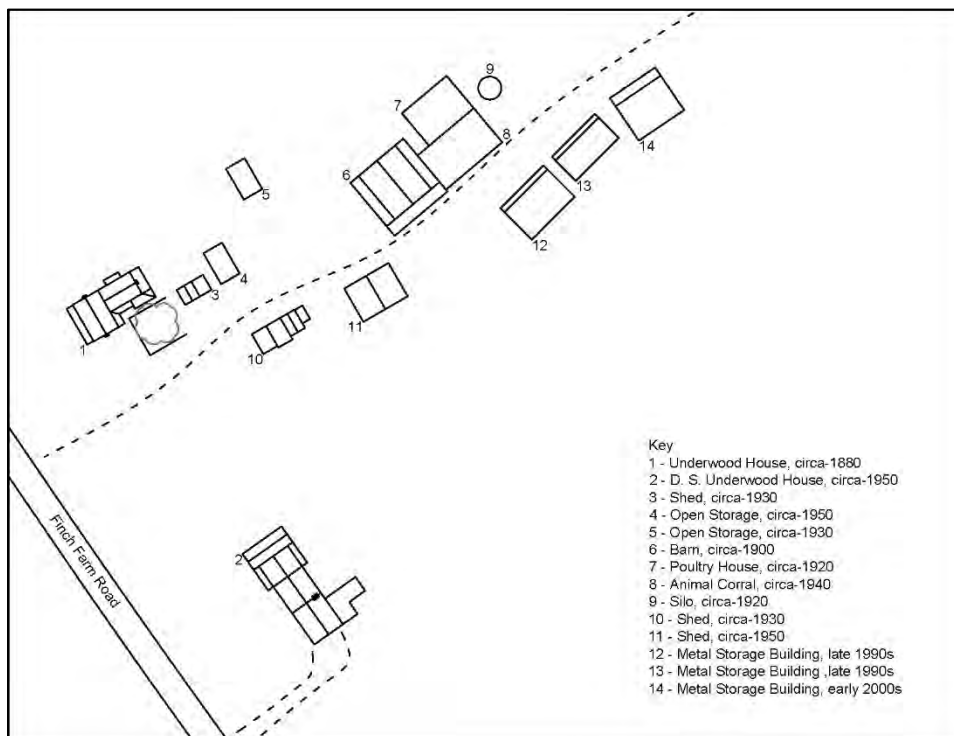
Site plan of Underwood Farm, western portion.
